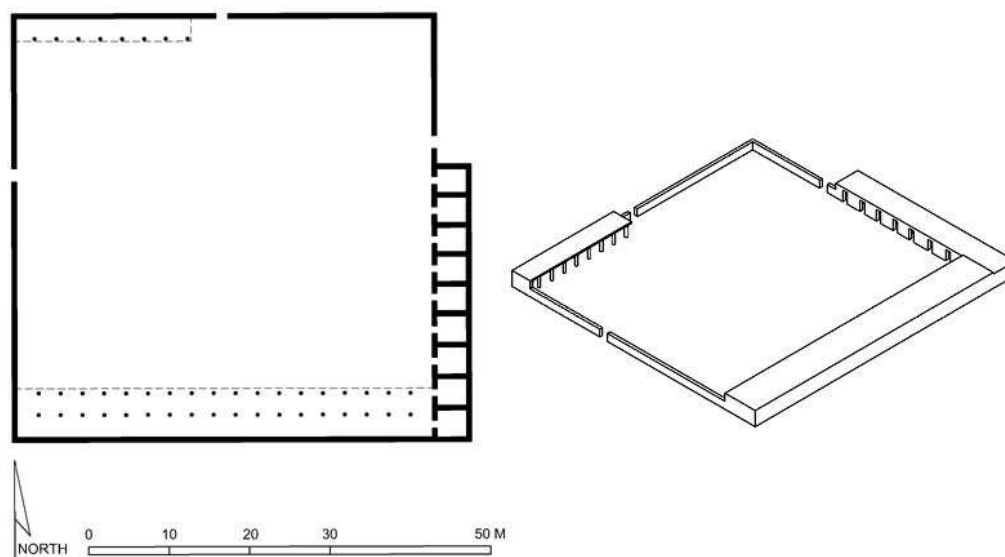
Reconstructed floor plan and perspective drawing of Prophet's House, Medina, Saudi Arabia.
